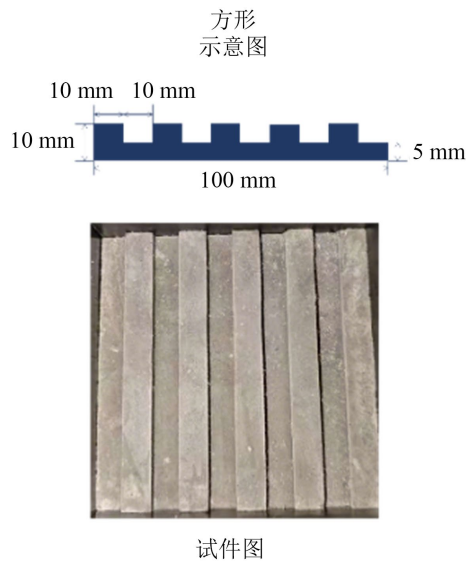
Schematic diagram of square plastic mold dimensions and specimen casting
